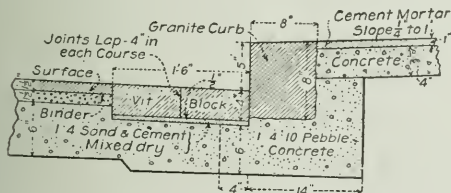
Granite Curb and Vitrified Brick Gutter.
